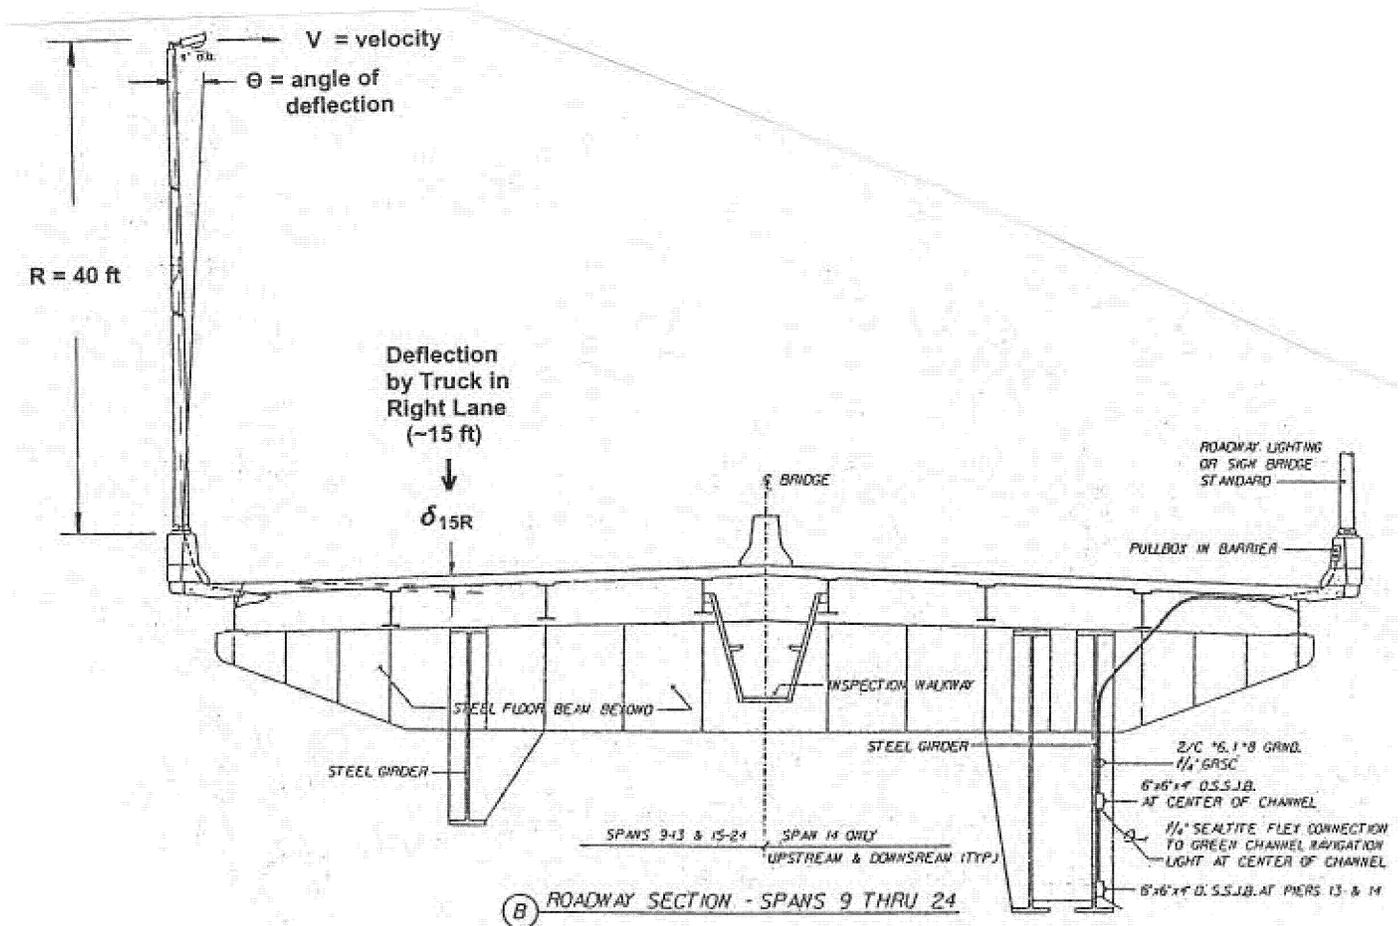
Typical cross section of the roadway cut between floor beams at spans 9 through 24. The deck stringers (24 WF 68) are composite with the deck between floor beams, permitting rigidity of the deck as a truck passes by. In the analysis of this report, truck axle loadings cause an approximate center loading, inducing deck deflection δ . The deck ends are restrained by the parapet, resulting in a final net deck end angle Θ_d . After Θ_d is generated at the parapet, that angle results in an approximately equal pole axis angle of deflection Θ_p .
